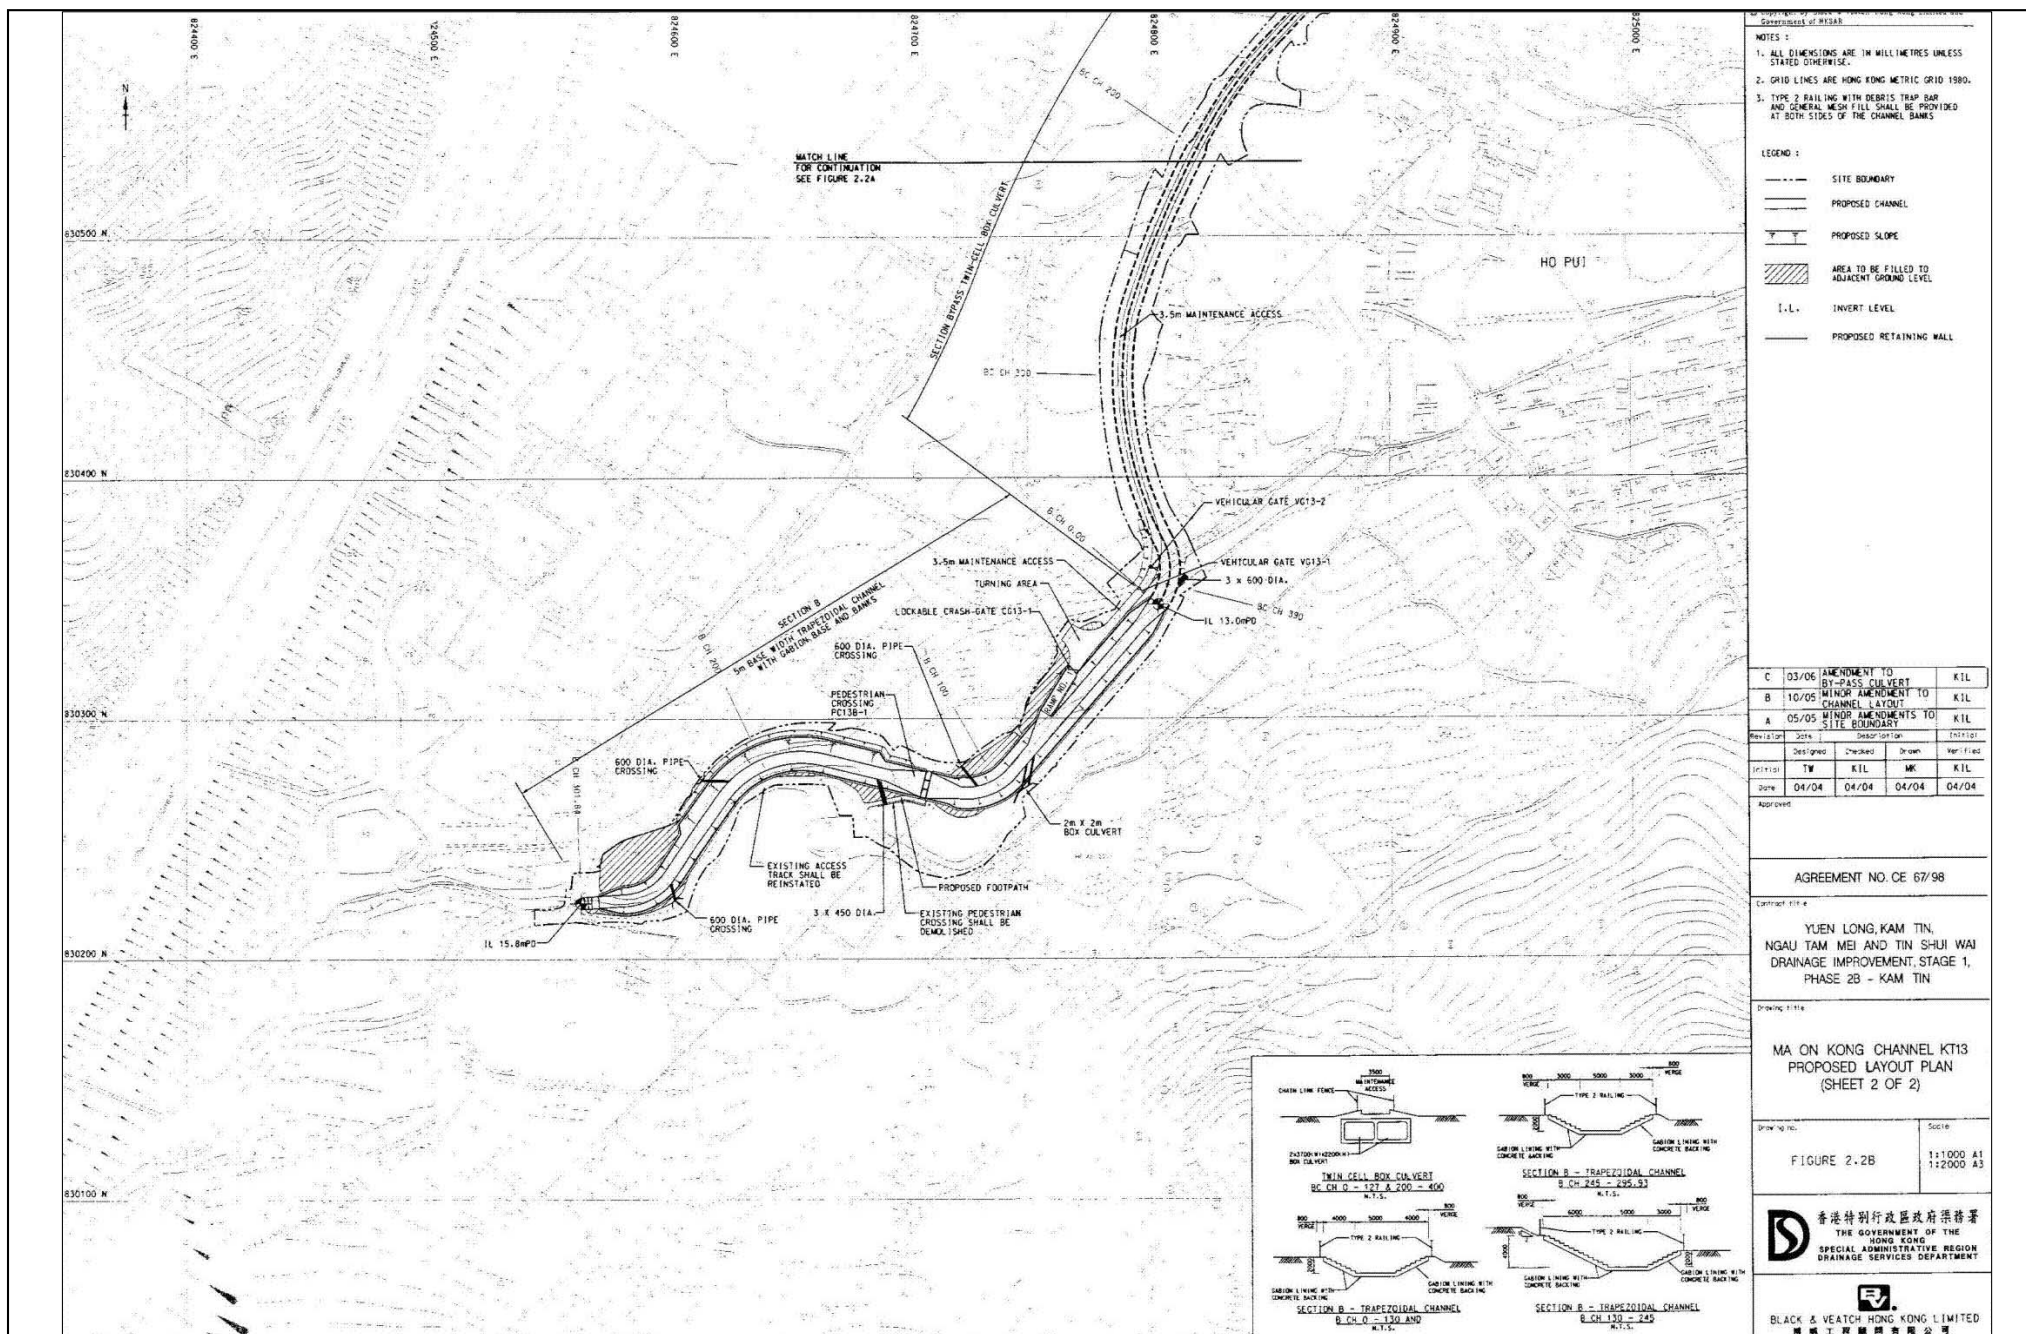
Proposed Layout Plan (Southern section of KT13) [Adopted from Figure 2.2B in the EIA Report]
